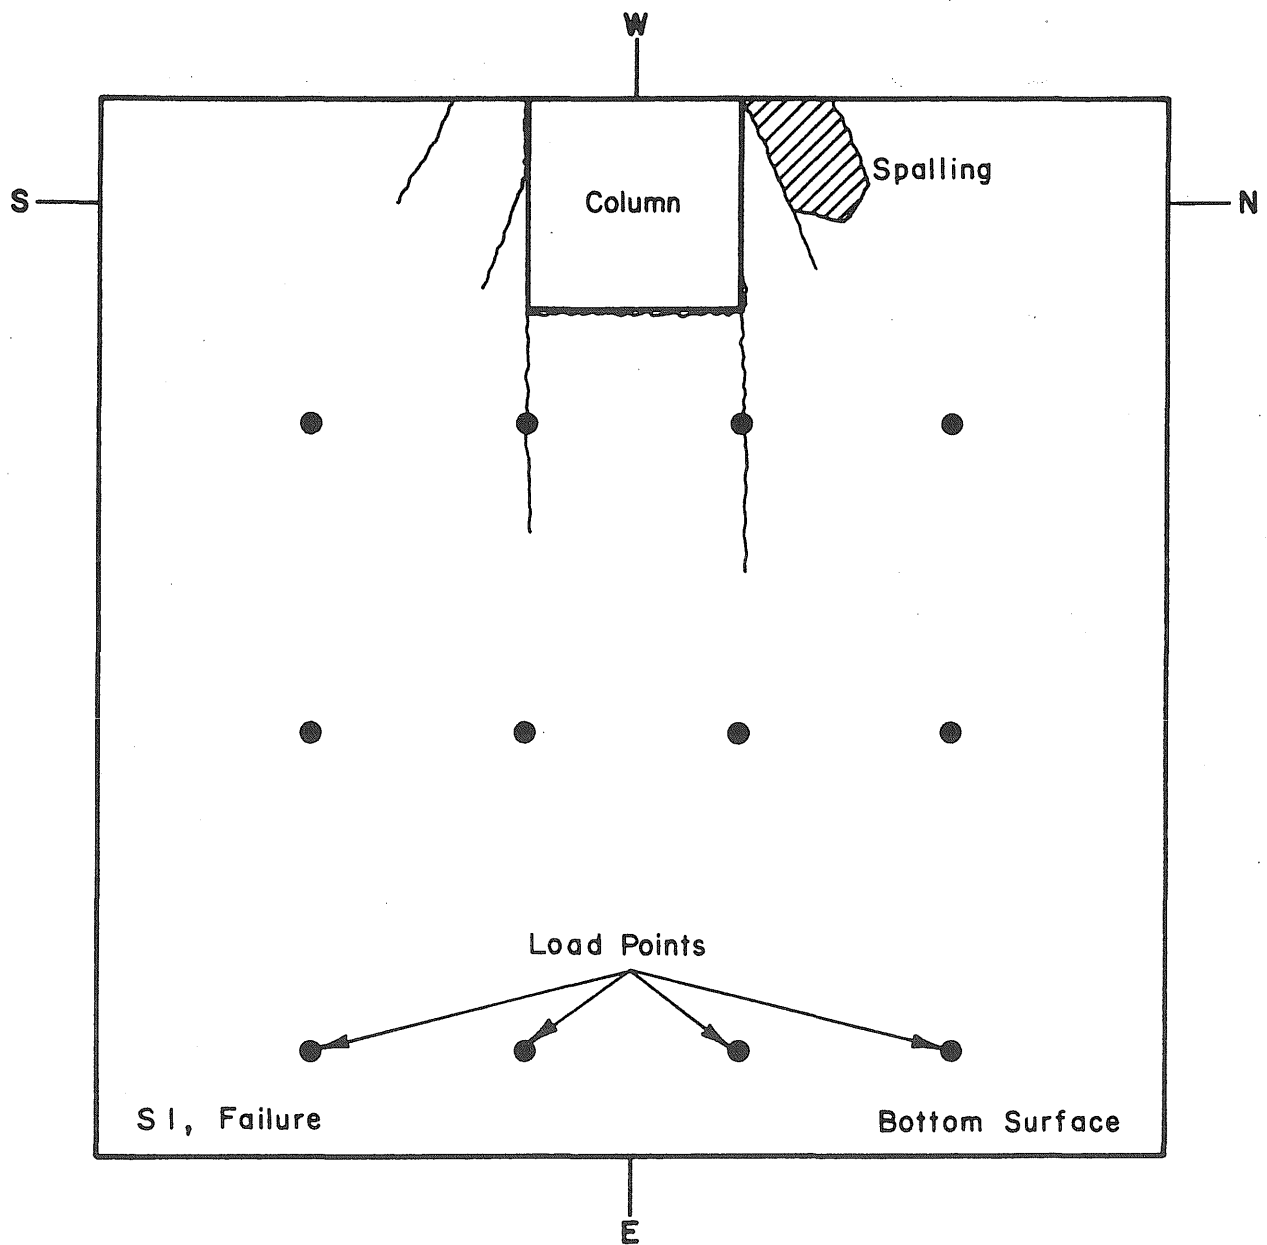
Crack Pattern at Failure on the Bottom Surface of Specimen S1
